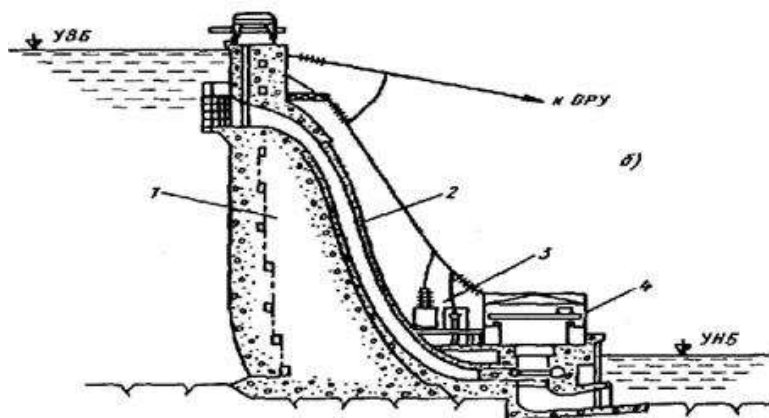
Dam hydroelectric power plants: 1 – dam; 2 – water conduit; 3 – high voltage electrical equipment site; 4 – the building of the hydroelectric power plant engine room
